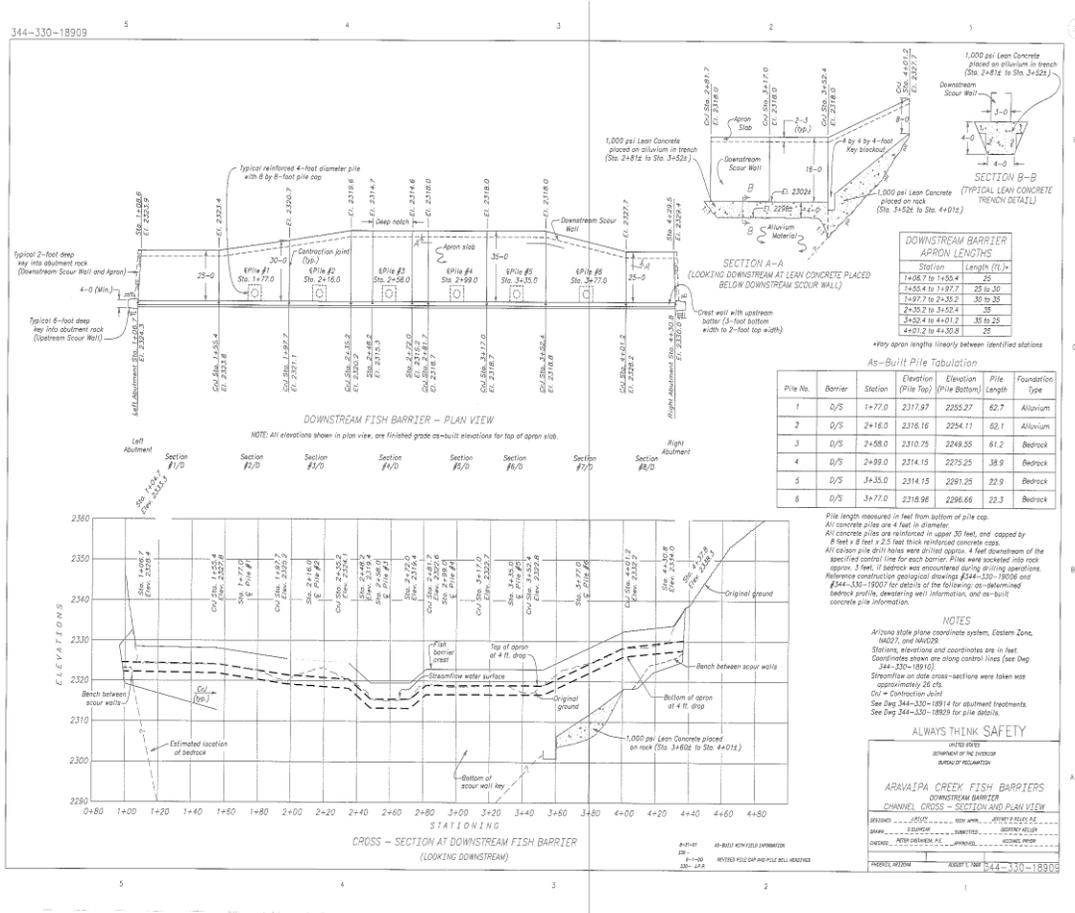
Channel cross-section and plan view of downstream Aravaipa Creek barrier.
